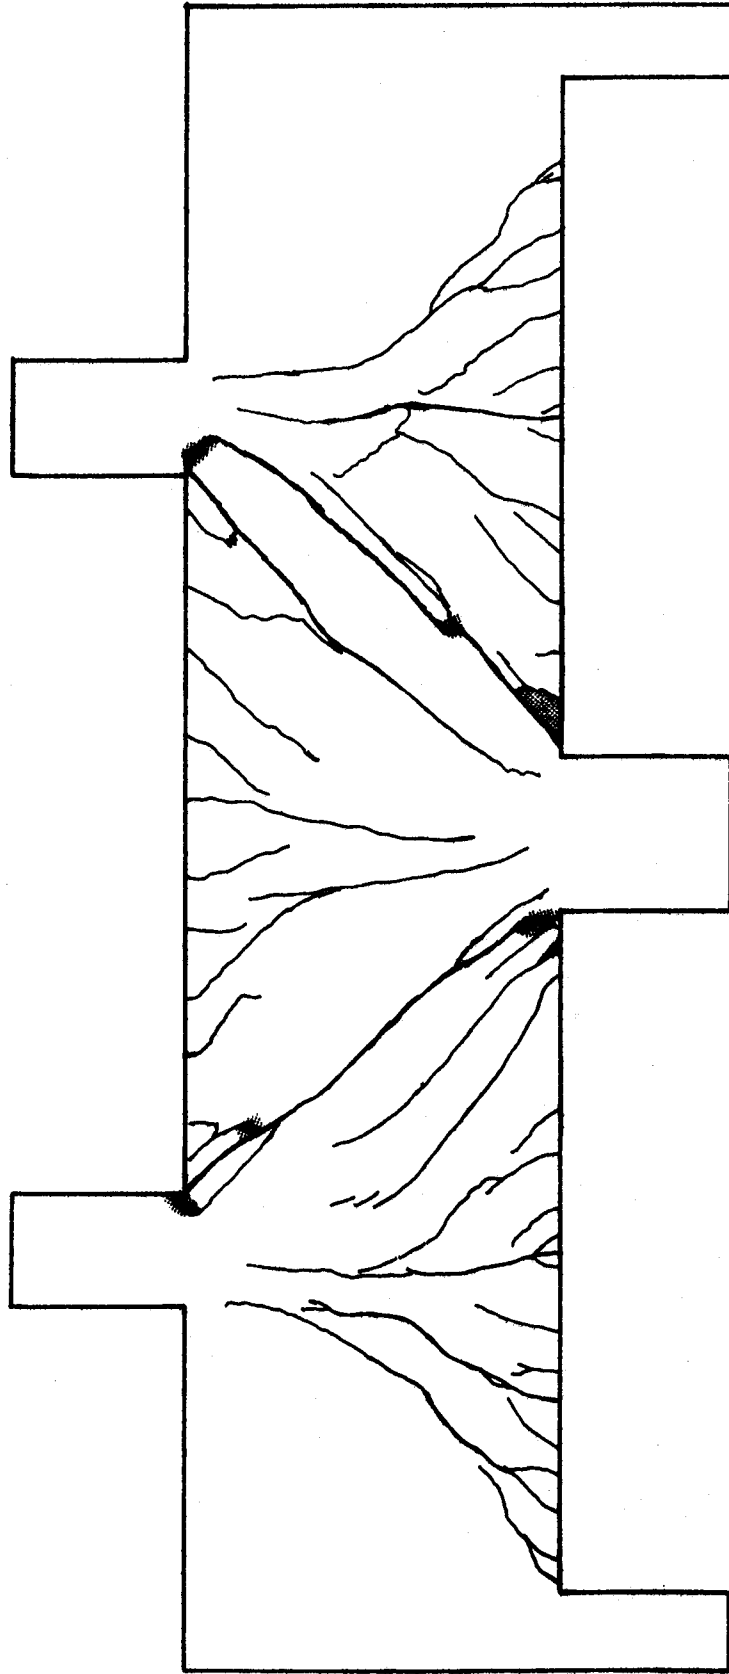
Beam 3/1.0 Crack Pattern - East Face (Reversed)
